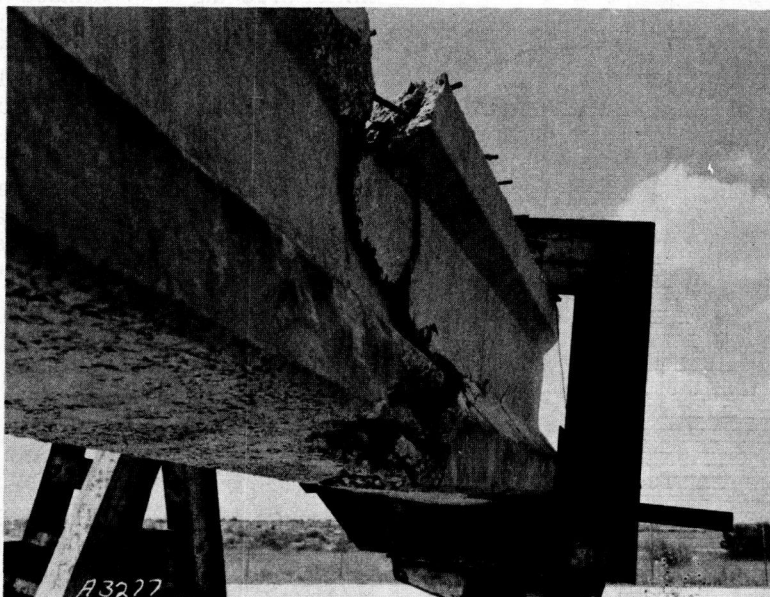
Beam failure, torsion test, pretensioned beam.
